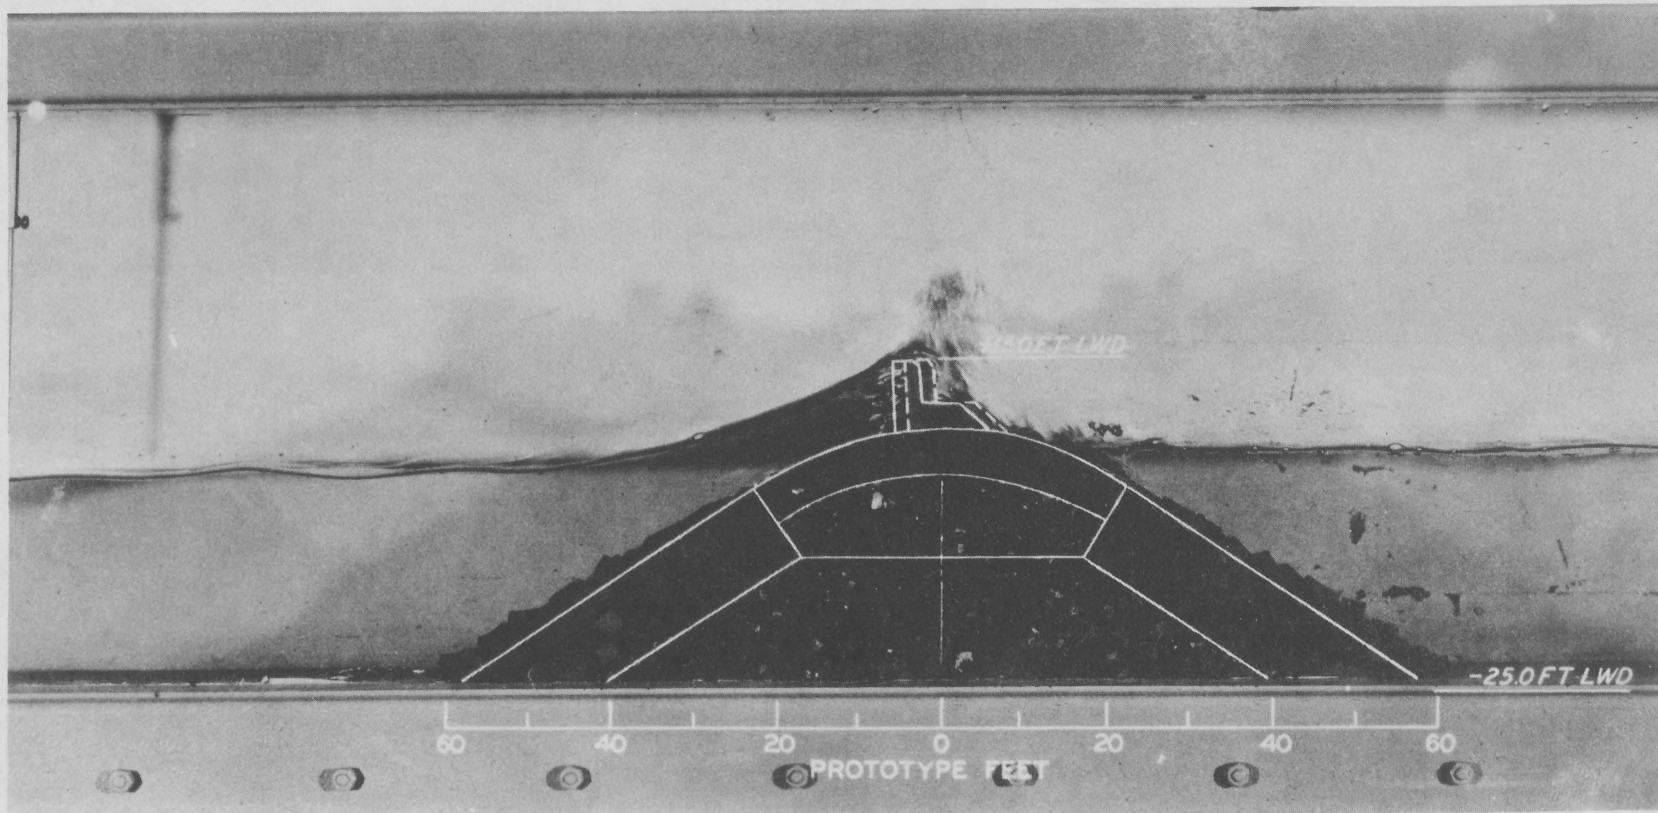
1:55-scale test section with maximum failing parapet (10-second, 10.5-foot waves), Indiana Harbor breakwater model (Hudson and Wilson, 1953).
